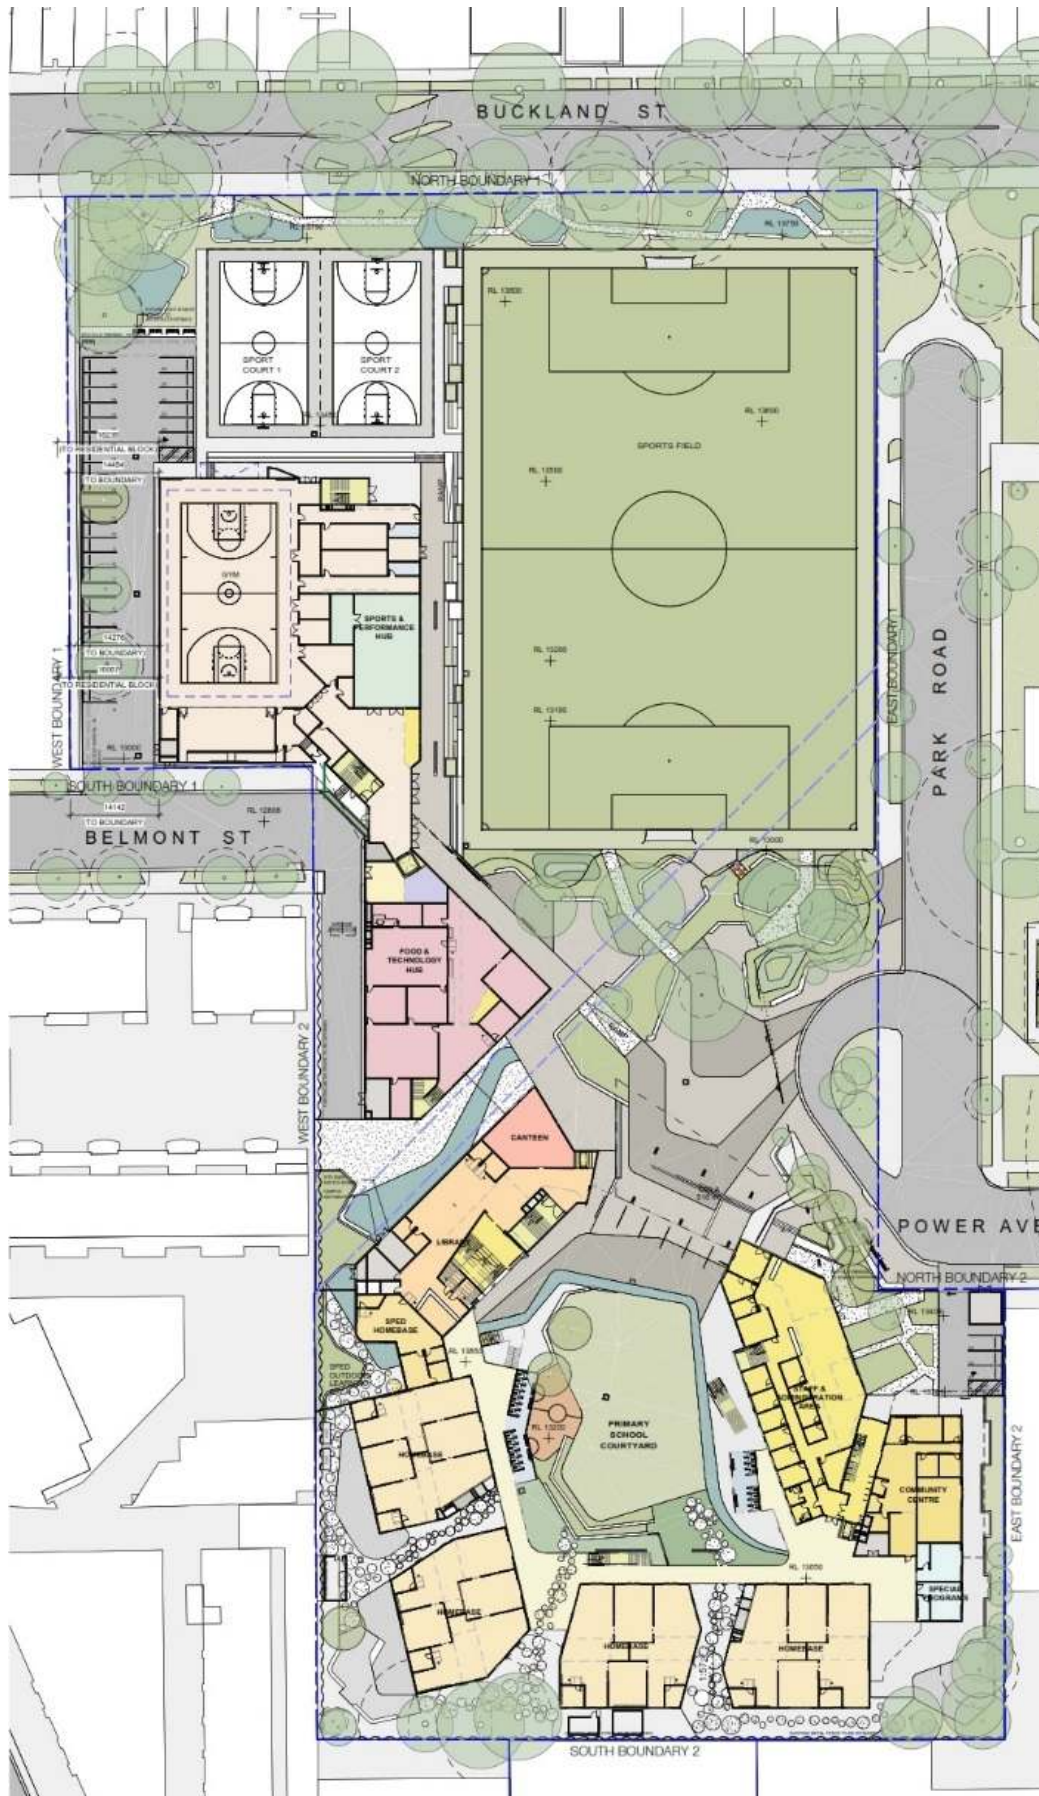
Proposed ground floor plan (TKD Architects, Drawing No. AR.SD.2001, Revision P1).
